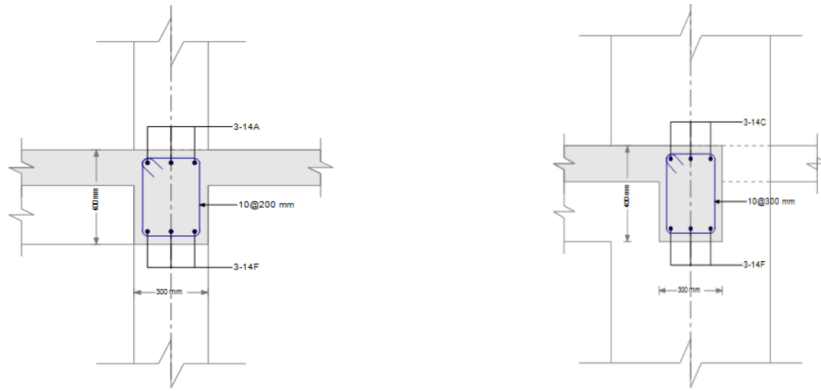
Reinforcement arrangement and design status for each beam section.
